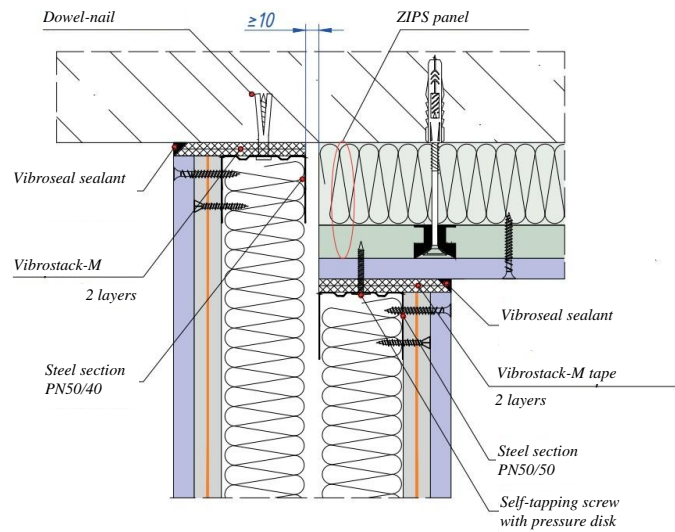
Connection of double-frame soundproofing partition to ZIPS panel system on a floor slab on one side of the partition.
